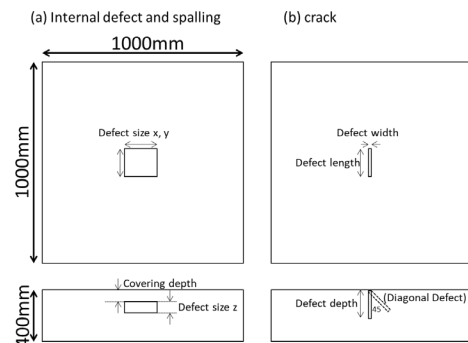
conditions of concrete mock-ups (a) internal defect and spalling, (b) crack.
